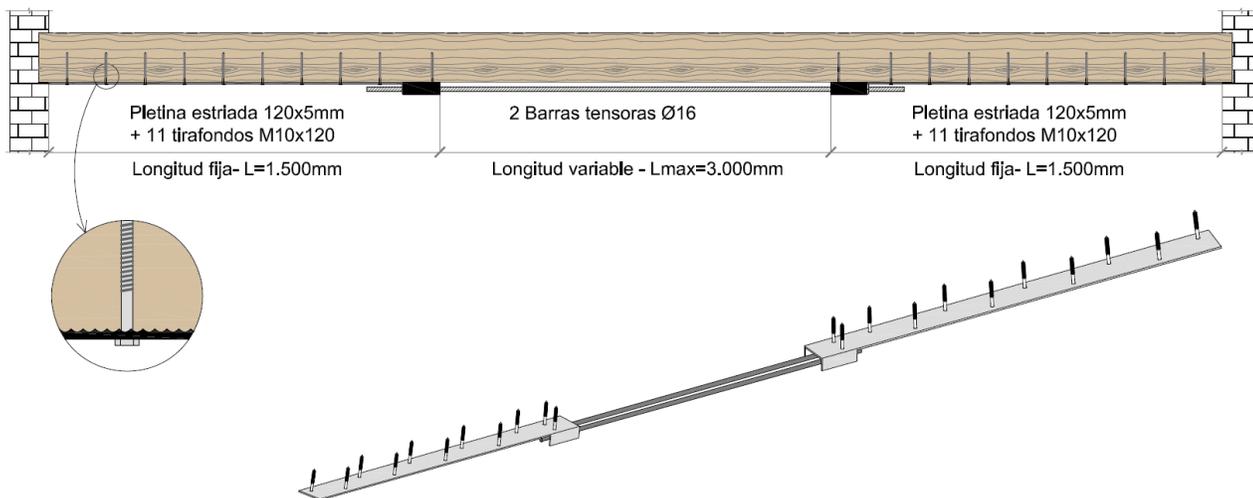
Diagram of the system, used to prevent and control unforeseen deformations in the wood joists. It's composed of 2 main parts: splined plates with lag bolts for fastening to wooden beam (one on each end of the beam), two tensioning bars that connect both plates and are responsible for providing the necessary tension to control the deflection of the beam. ©HERMS
